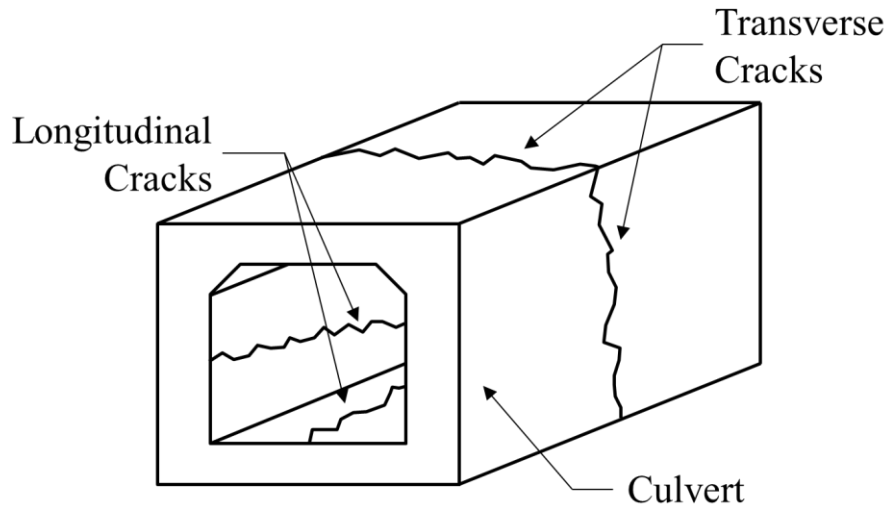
Longitudinal and Transverse Crack Illustration in a Box Culvert
